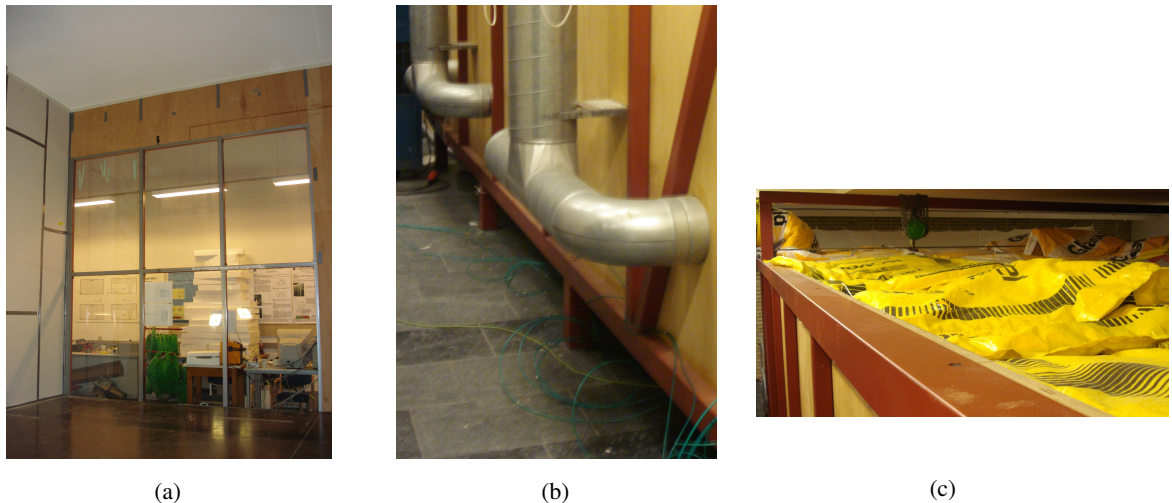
Pictures showing a) test room from inside, b) test room from outside, c) insulation above the room.
